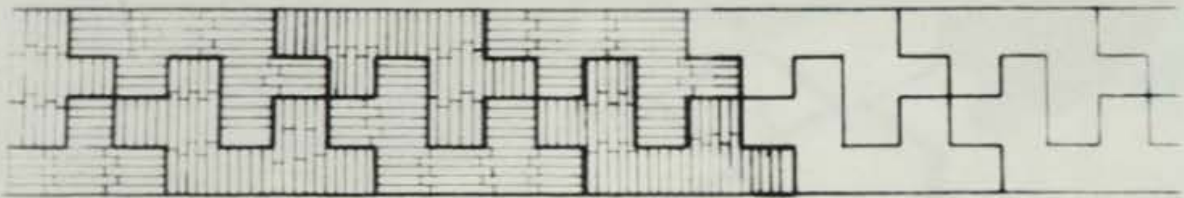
Wazir Khan Mosque, Lahore - cut and dressed flooring in geometrical pattern.
